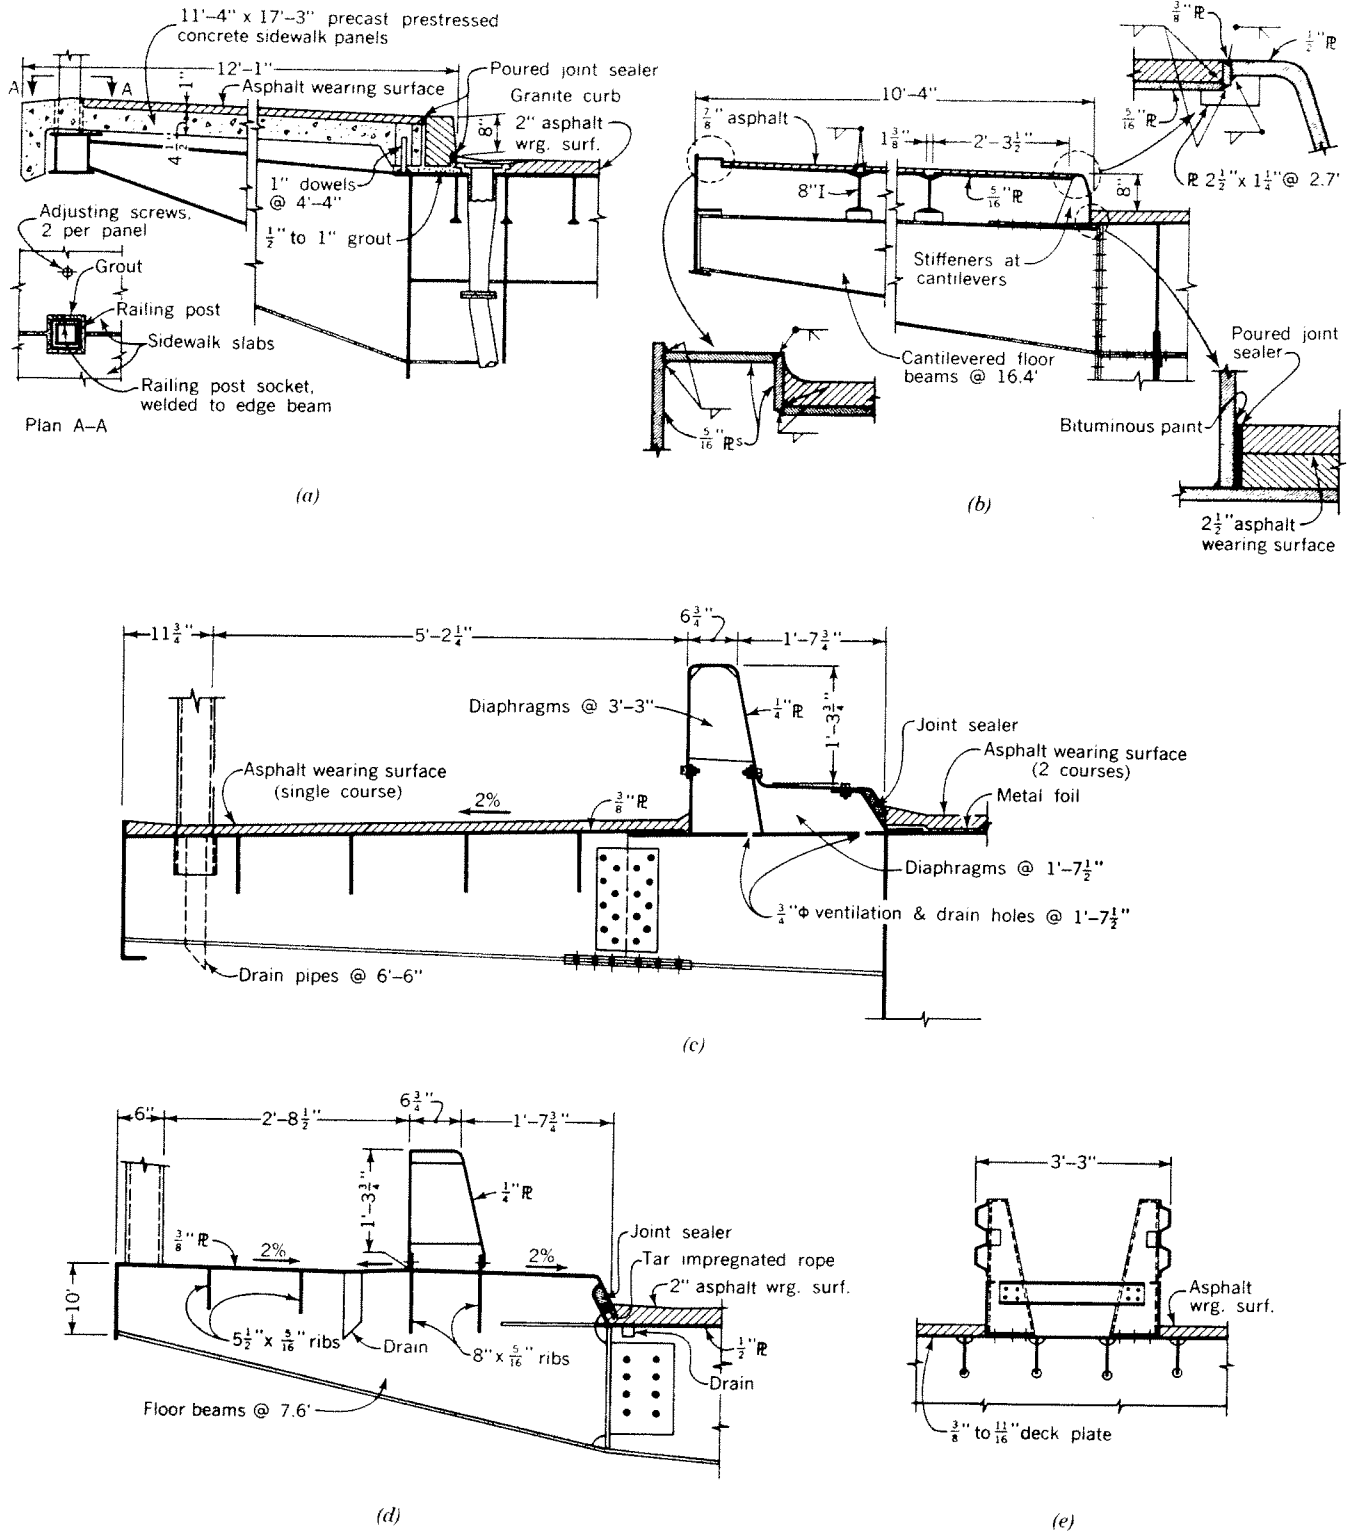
Miscellaneous details: (a) Sidewalk and curb, Rhine River Bridge at Speyer [79]. (b) Sidewalk and curb, St. Alban Bridge, Basle [67]. (c) Sidewalk, traffic barrier and curb, Fehmarnsund Bridge [72]. (d) Sidewalk, traffic barrier and curb, Haseltal Bridge [72]. (e) Center traffic divider, Europe Bridge [58]
